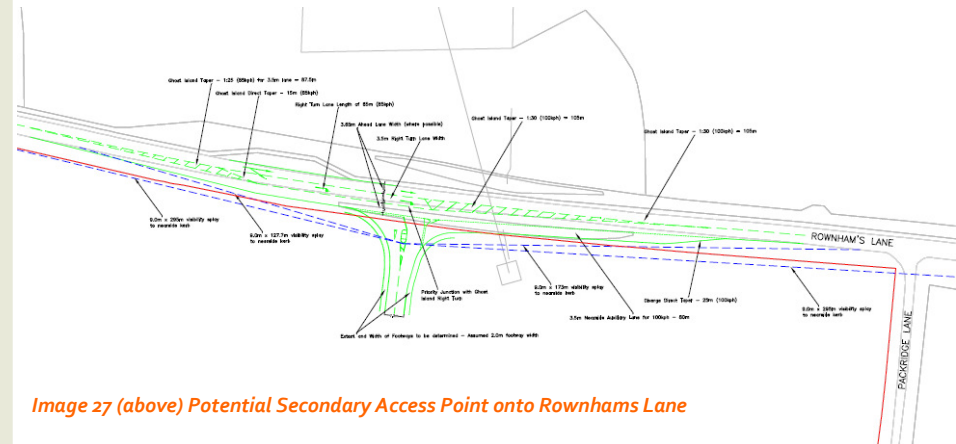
(above) Potential Secondary Access Point onto Rownhams Lane
